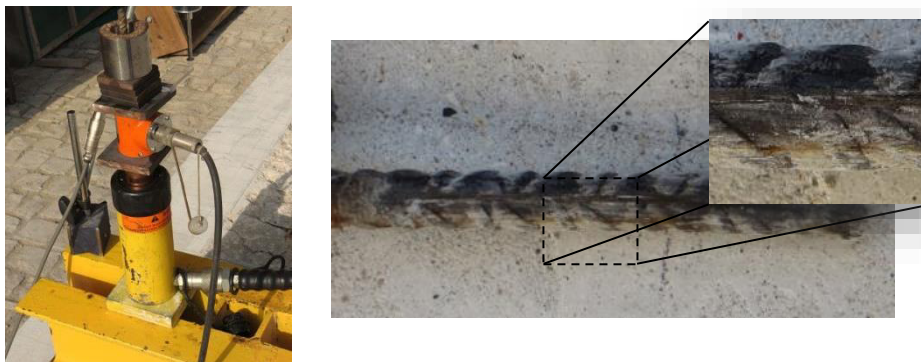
Pull-out testing of rebar embedded with grout (example for 6 mm rebar with a 50 mm embedment length).
